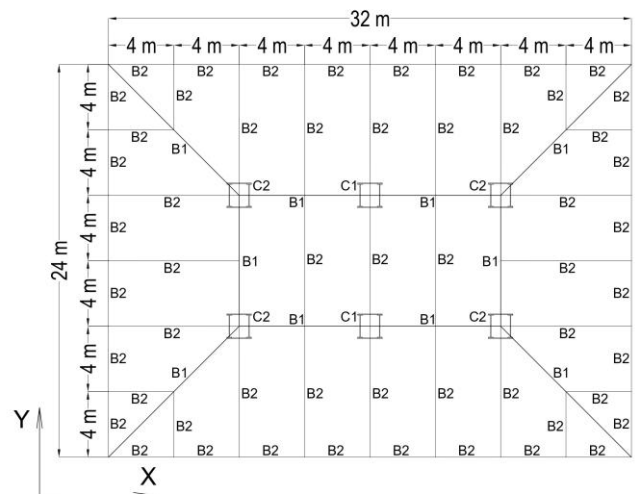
Floor Plan of a 40 storey tall diagrid structure
